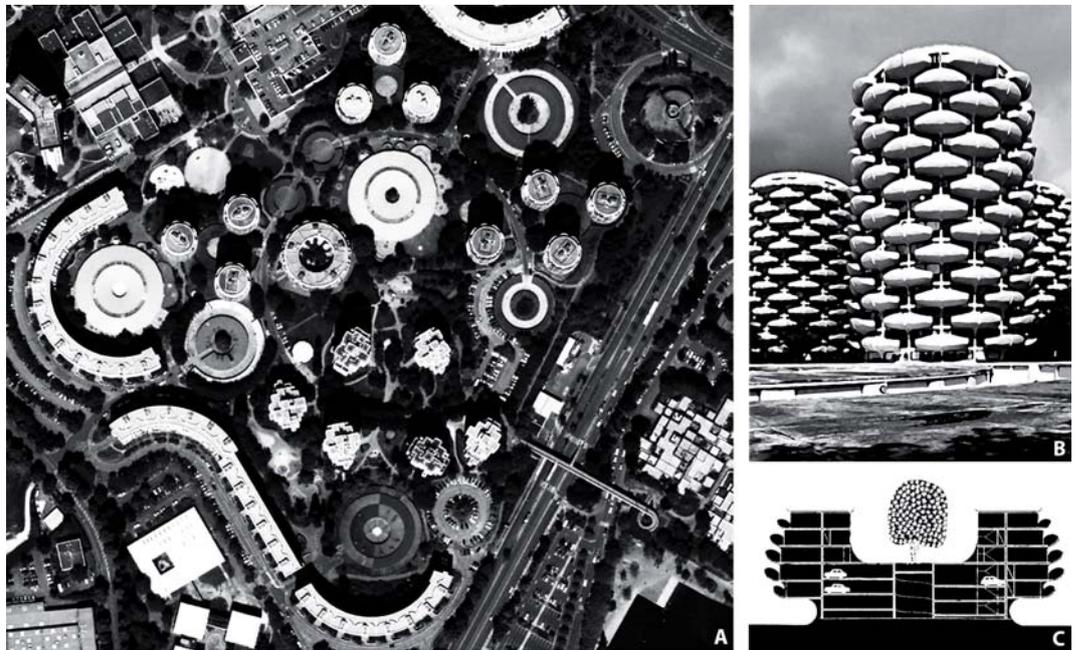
G. Grandval, Complex called Les Choux de Creteil, site plan, view, section (source: <http://astudejaoublie.blogspot.com>)
